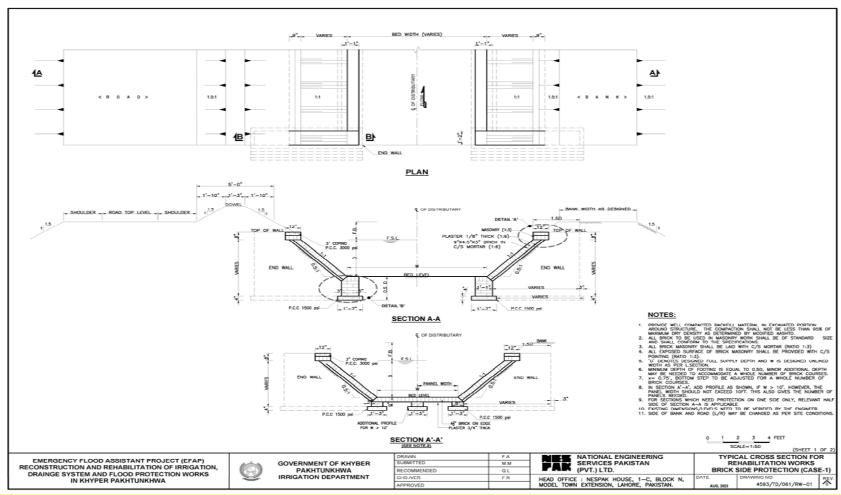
Typical Cross section for Rehabilitation works Brick Side Protection Wall
